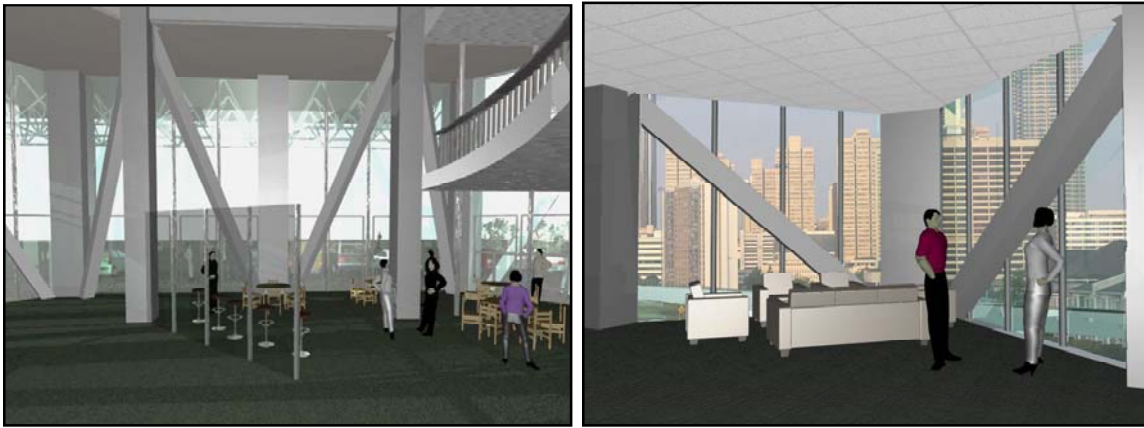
(a) Diagonal structural members integrated with a lounge on the ground floor; (b) Interior space of the building using the vertical folded façade system
